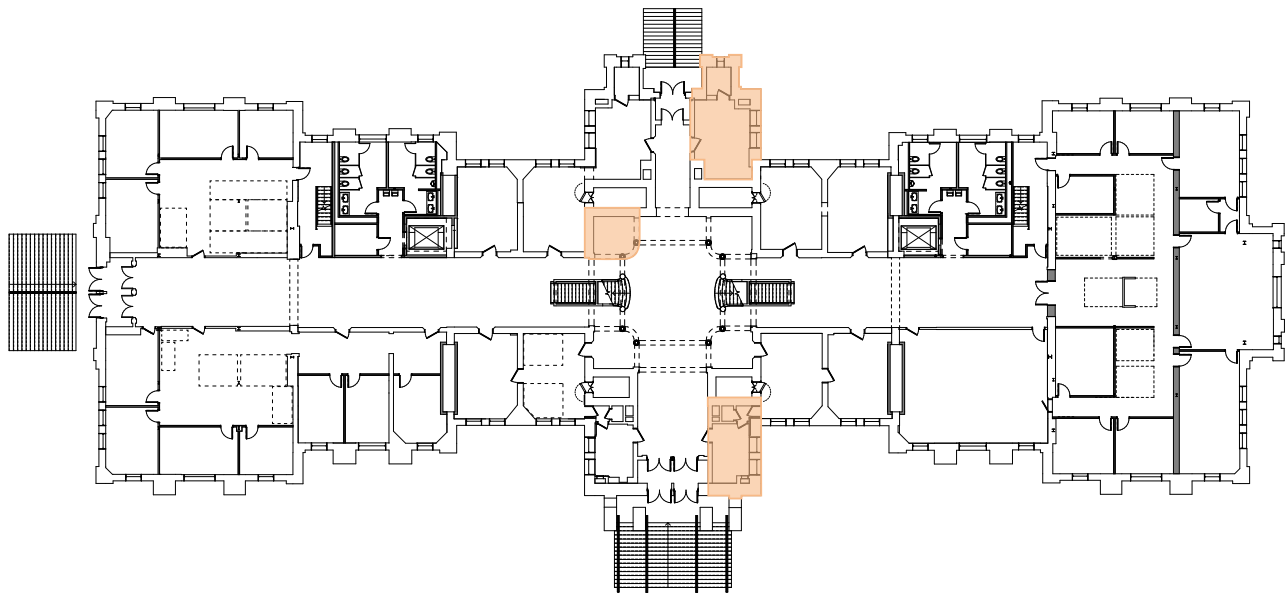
Proposed Space Allocation: Security - First Floor [Capitol]
